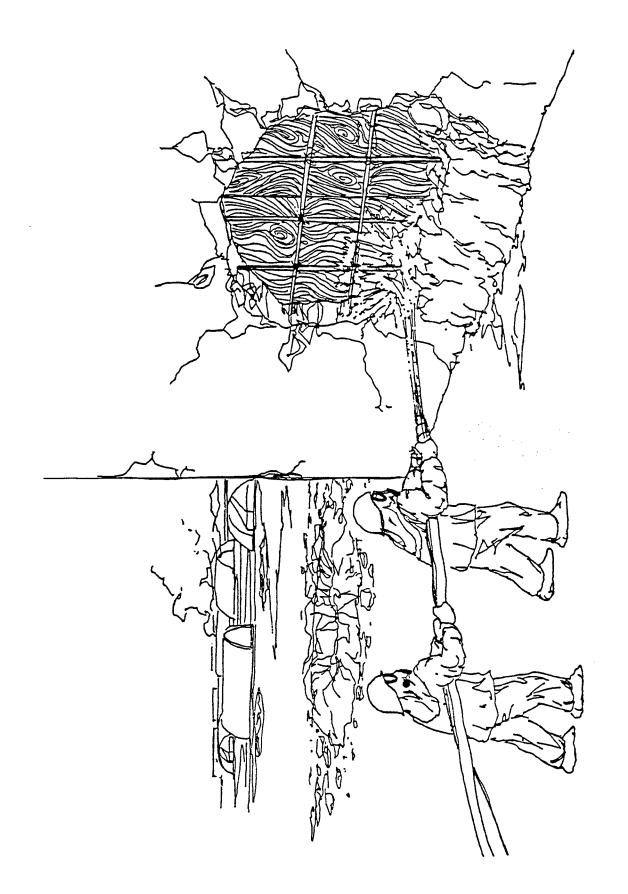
Shotcreting Damaged Area With Rebar In Place (Optional)
